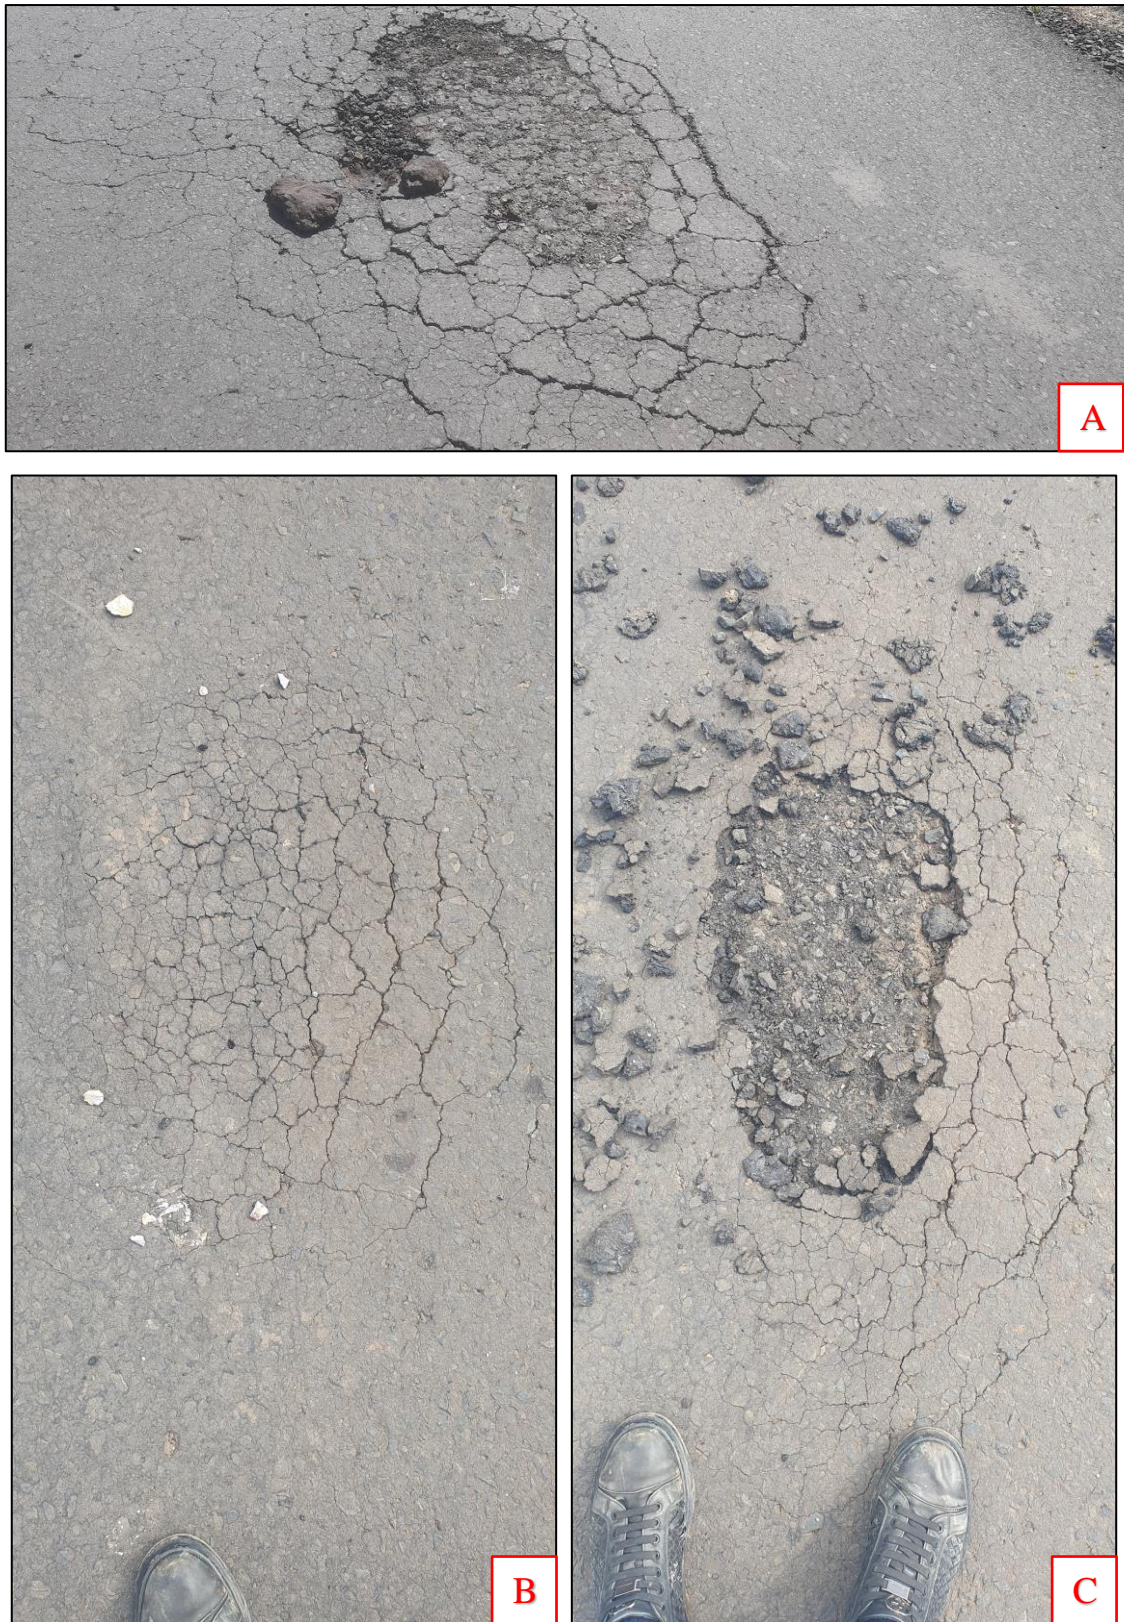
A&B) Cracking on newly placed asphalt C) Stripping of asphalt from aggregates
